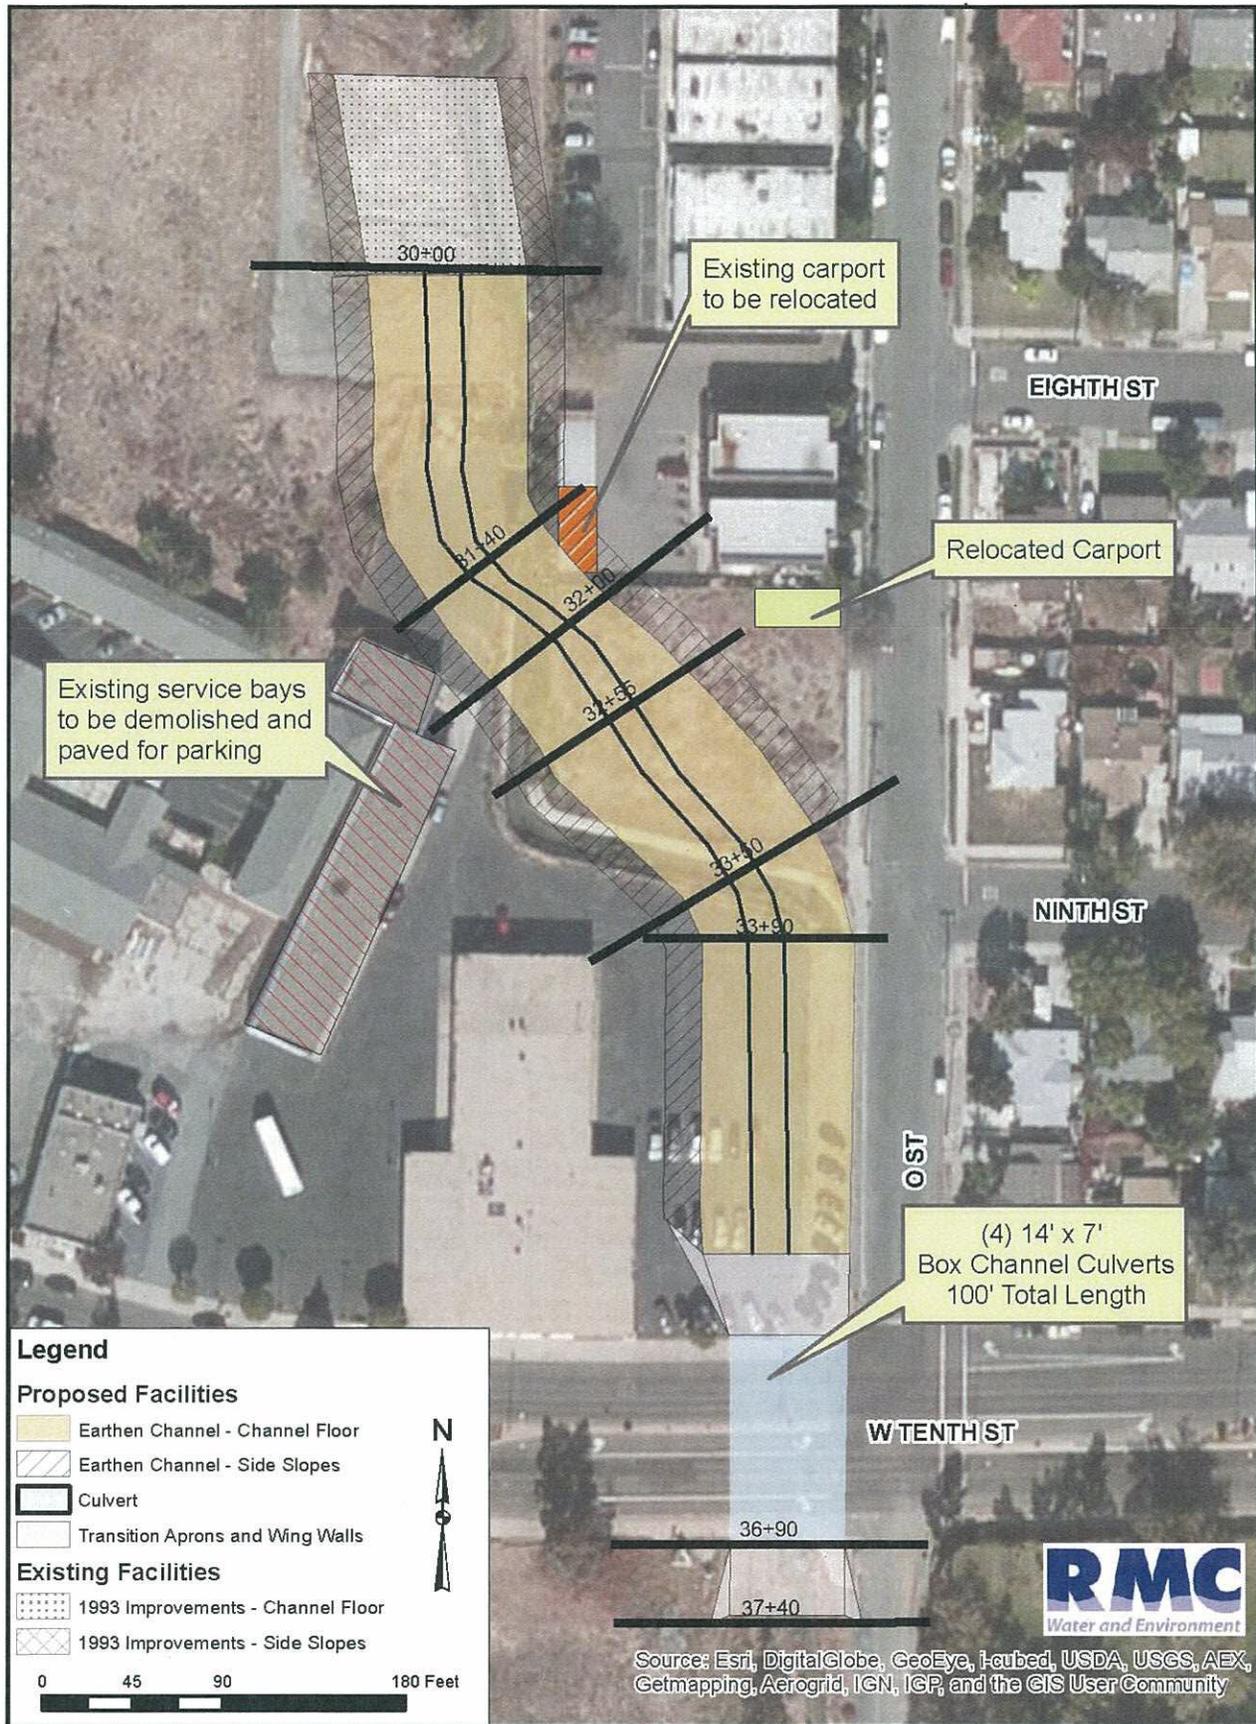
Alternative 5 - Alternate Minimum Culvert Option
